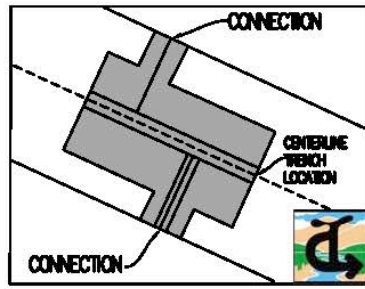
Example 12: Damaged pavement within 10 feet of a patch must also be patched.
